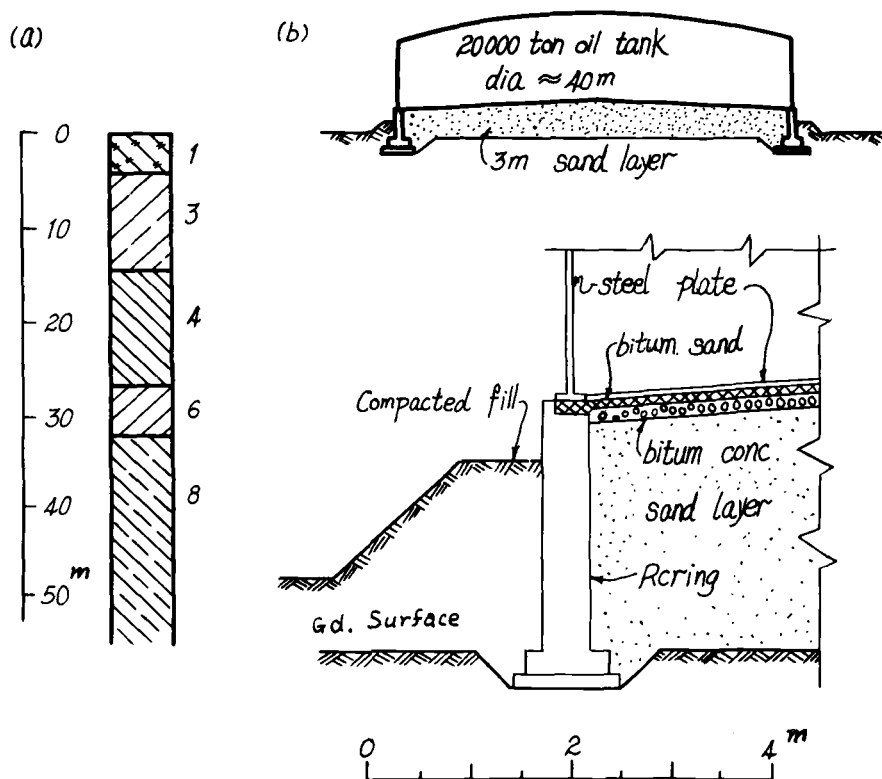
20 000-ton oil tank on hydraulic fill, at Site F, Fig. 2: (a) soil profile, see Table 1 for sequence of layers; (b) sketch of tank; and (c) reinforced concrete ring, berm, and sand layer.
